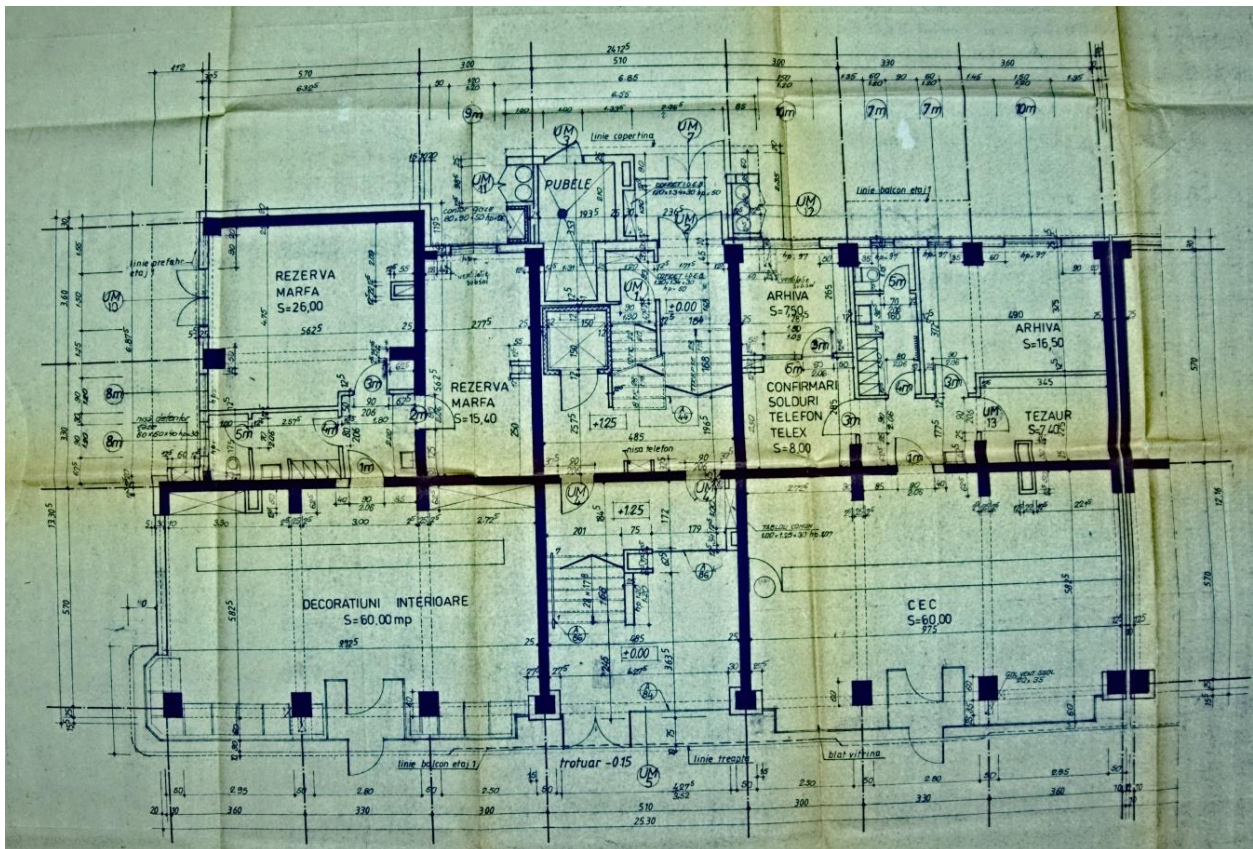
Ground Floor Plan (Original Execution Plans)
